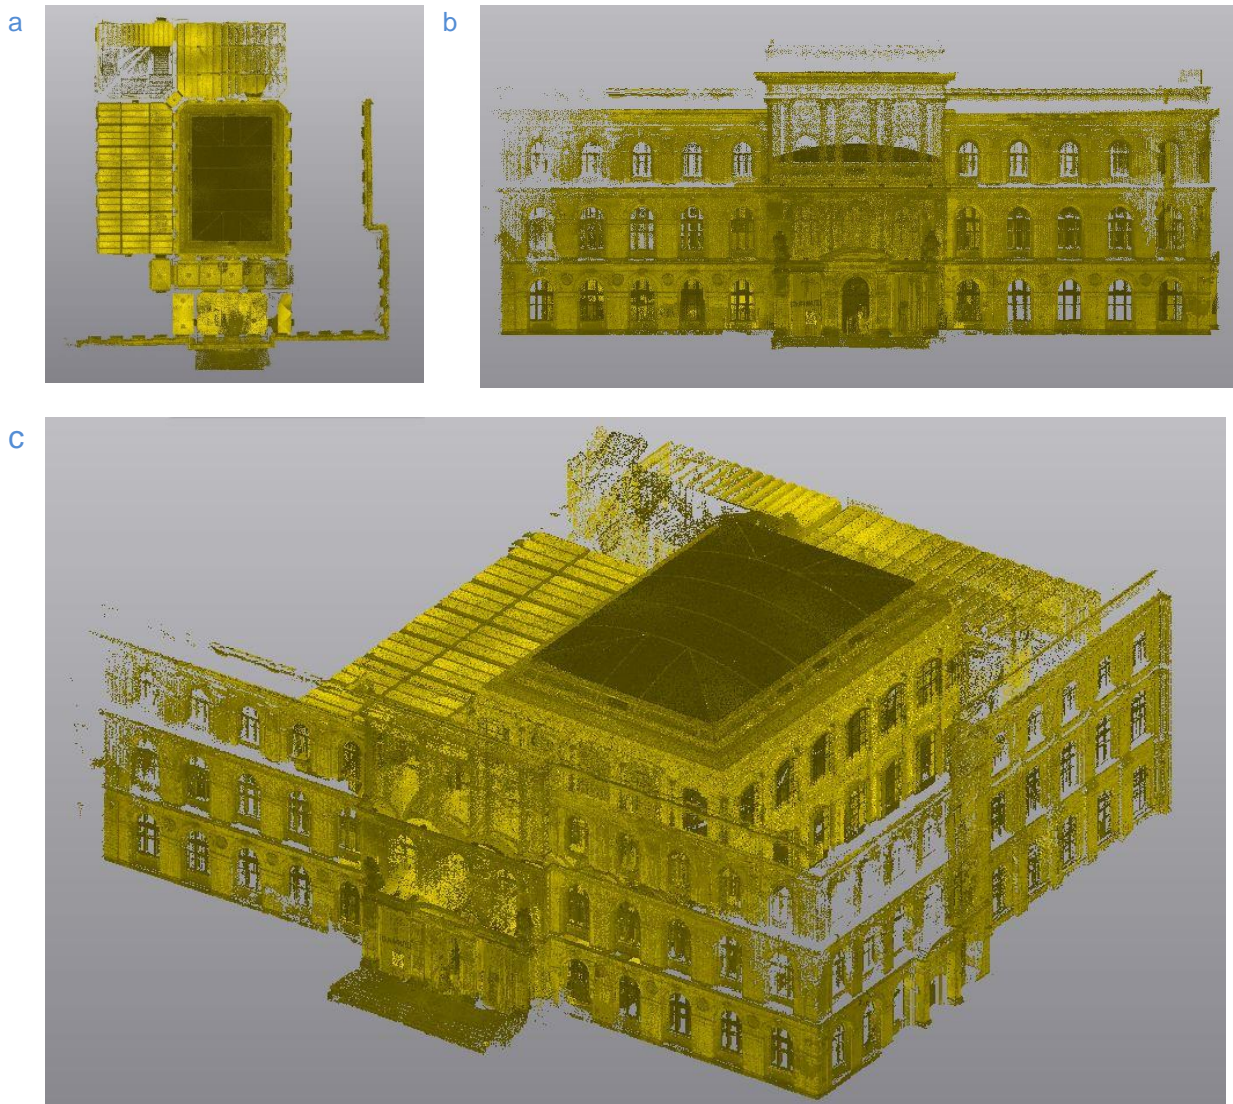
Nturkundemuseum model after segmentation and cleaning a-scanning stations plan, b- Southern façade, c-Perspective view (By author)
